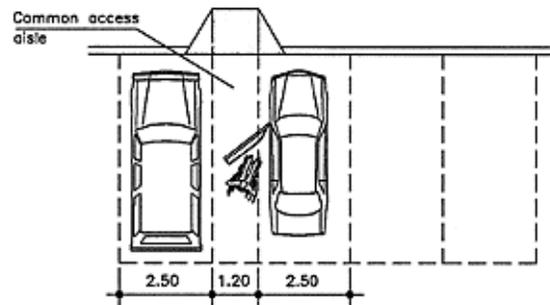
Parking width of 2.5 m with a common aisle of 1.2 m
